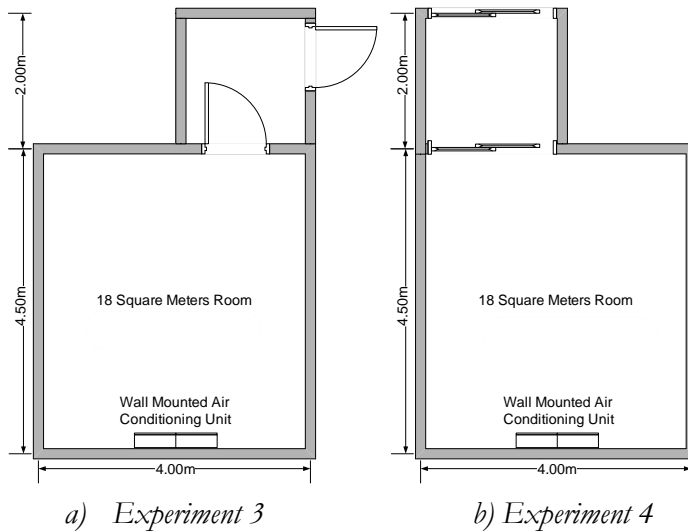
Floor Plan of a Vestibule without Air Curtain Experiment.
